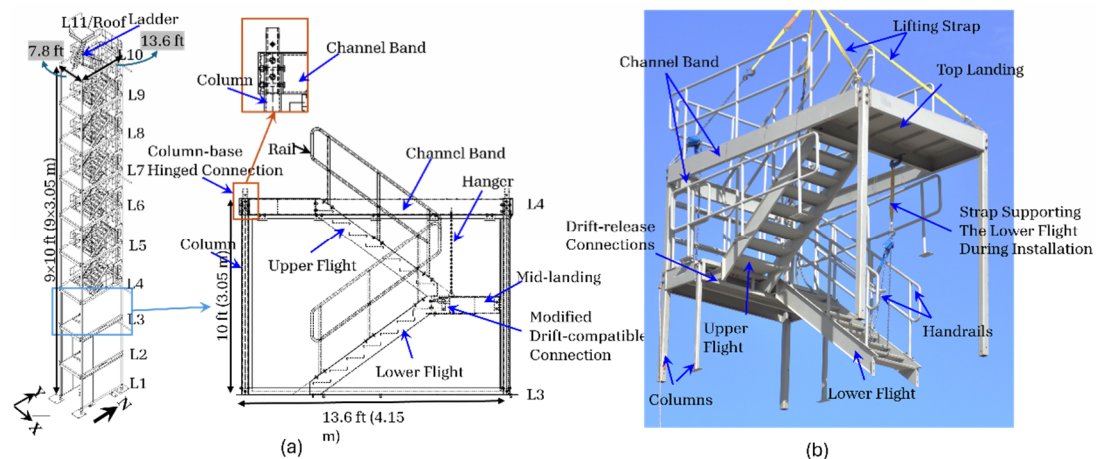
MSS tower (left) and typical modular stair system elevation view (right)
